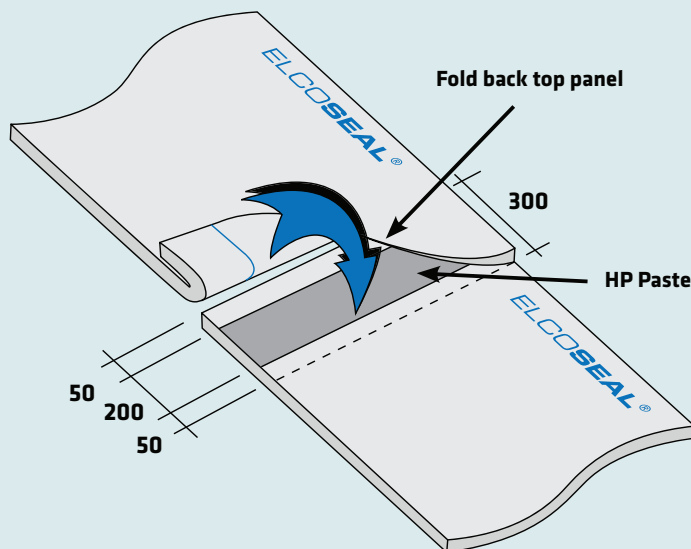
Transverse (end) overlap installation with applied HP Paste of minimum 200 mm width
